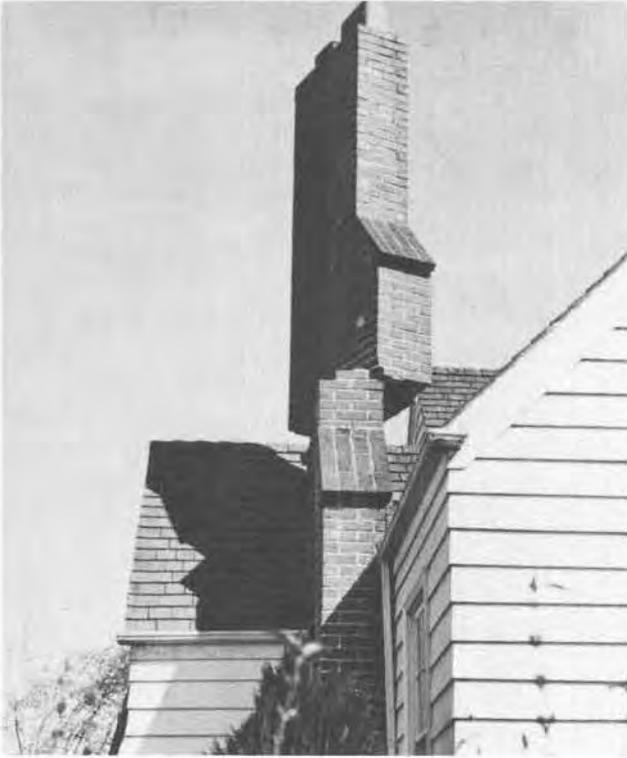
An unreinforced brick chimney in Kelso damaged during the 1949 Olympia earthquake. This chimney twisted on a mortar joint. (Photo from Edwards, 1951).
